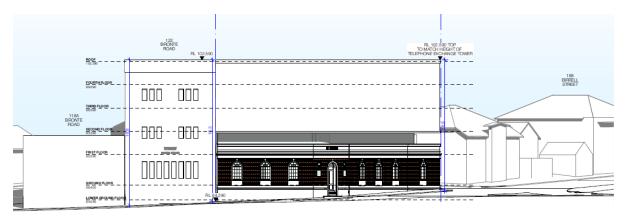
West elevation to Bronte Road looking north-east (Source: MHN Design Union)
